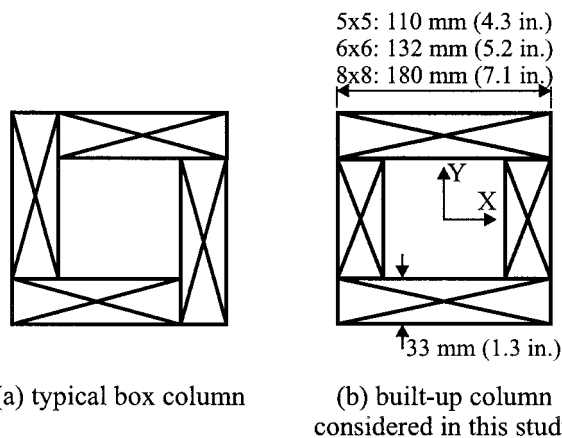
Built-Up Box Columns and Nominal Dimensions
